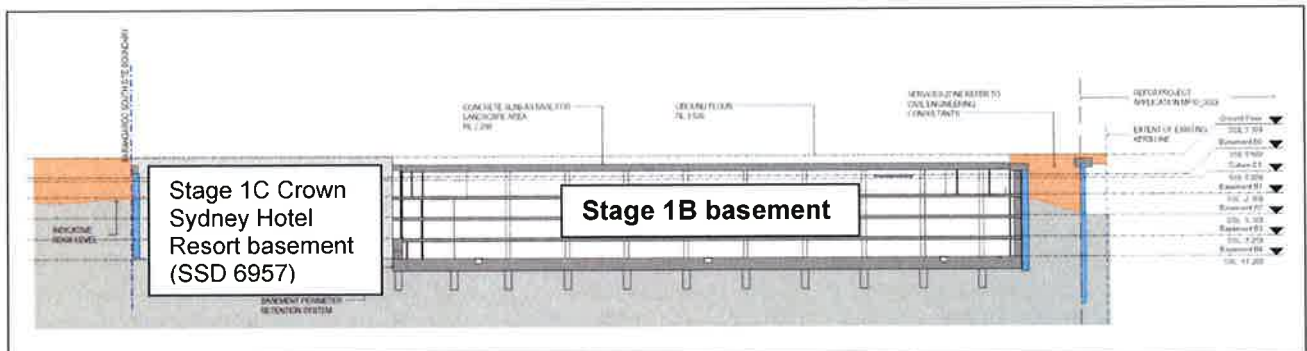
North-south cross section of the proposed basement car park (Source: EIS)
